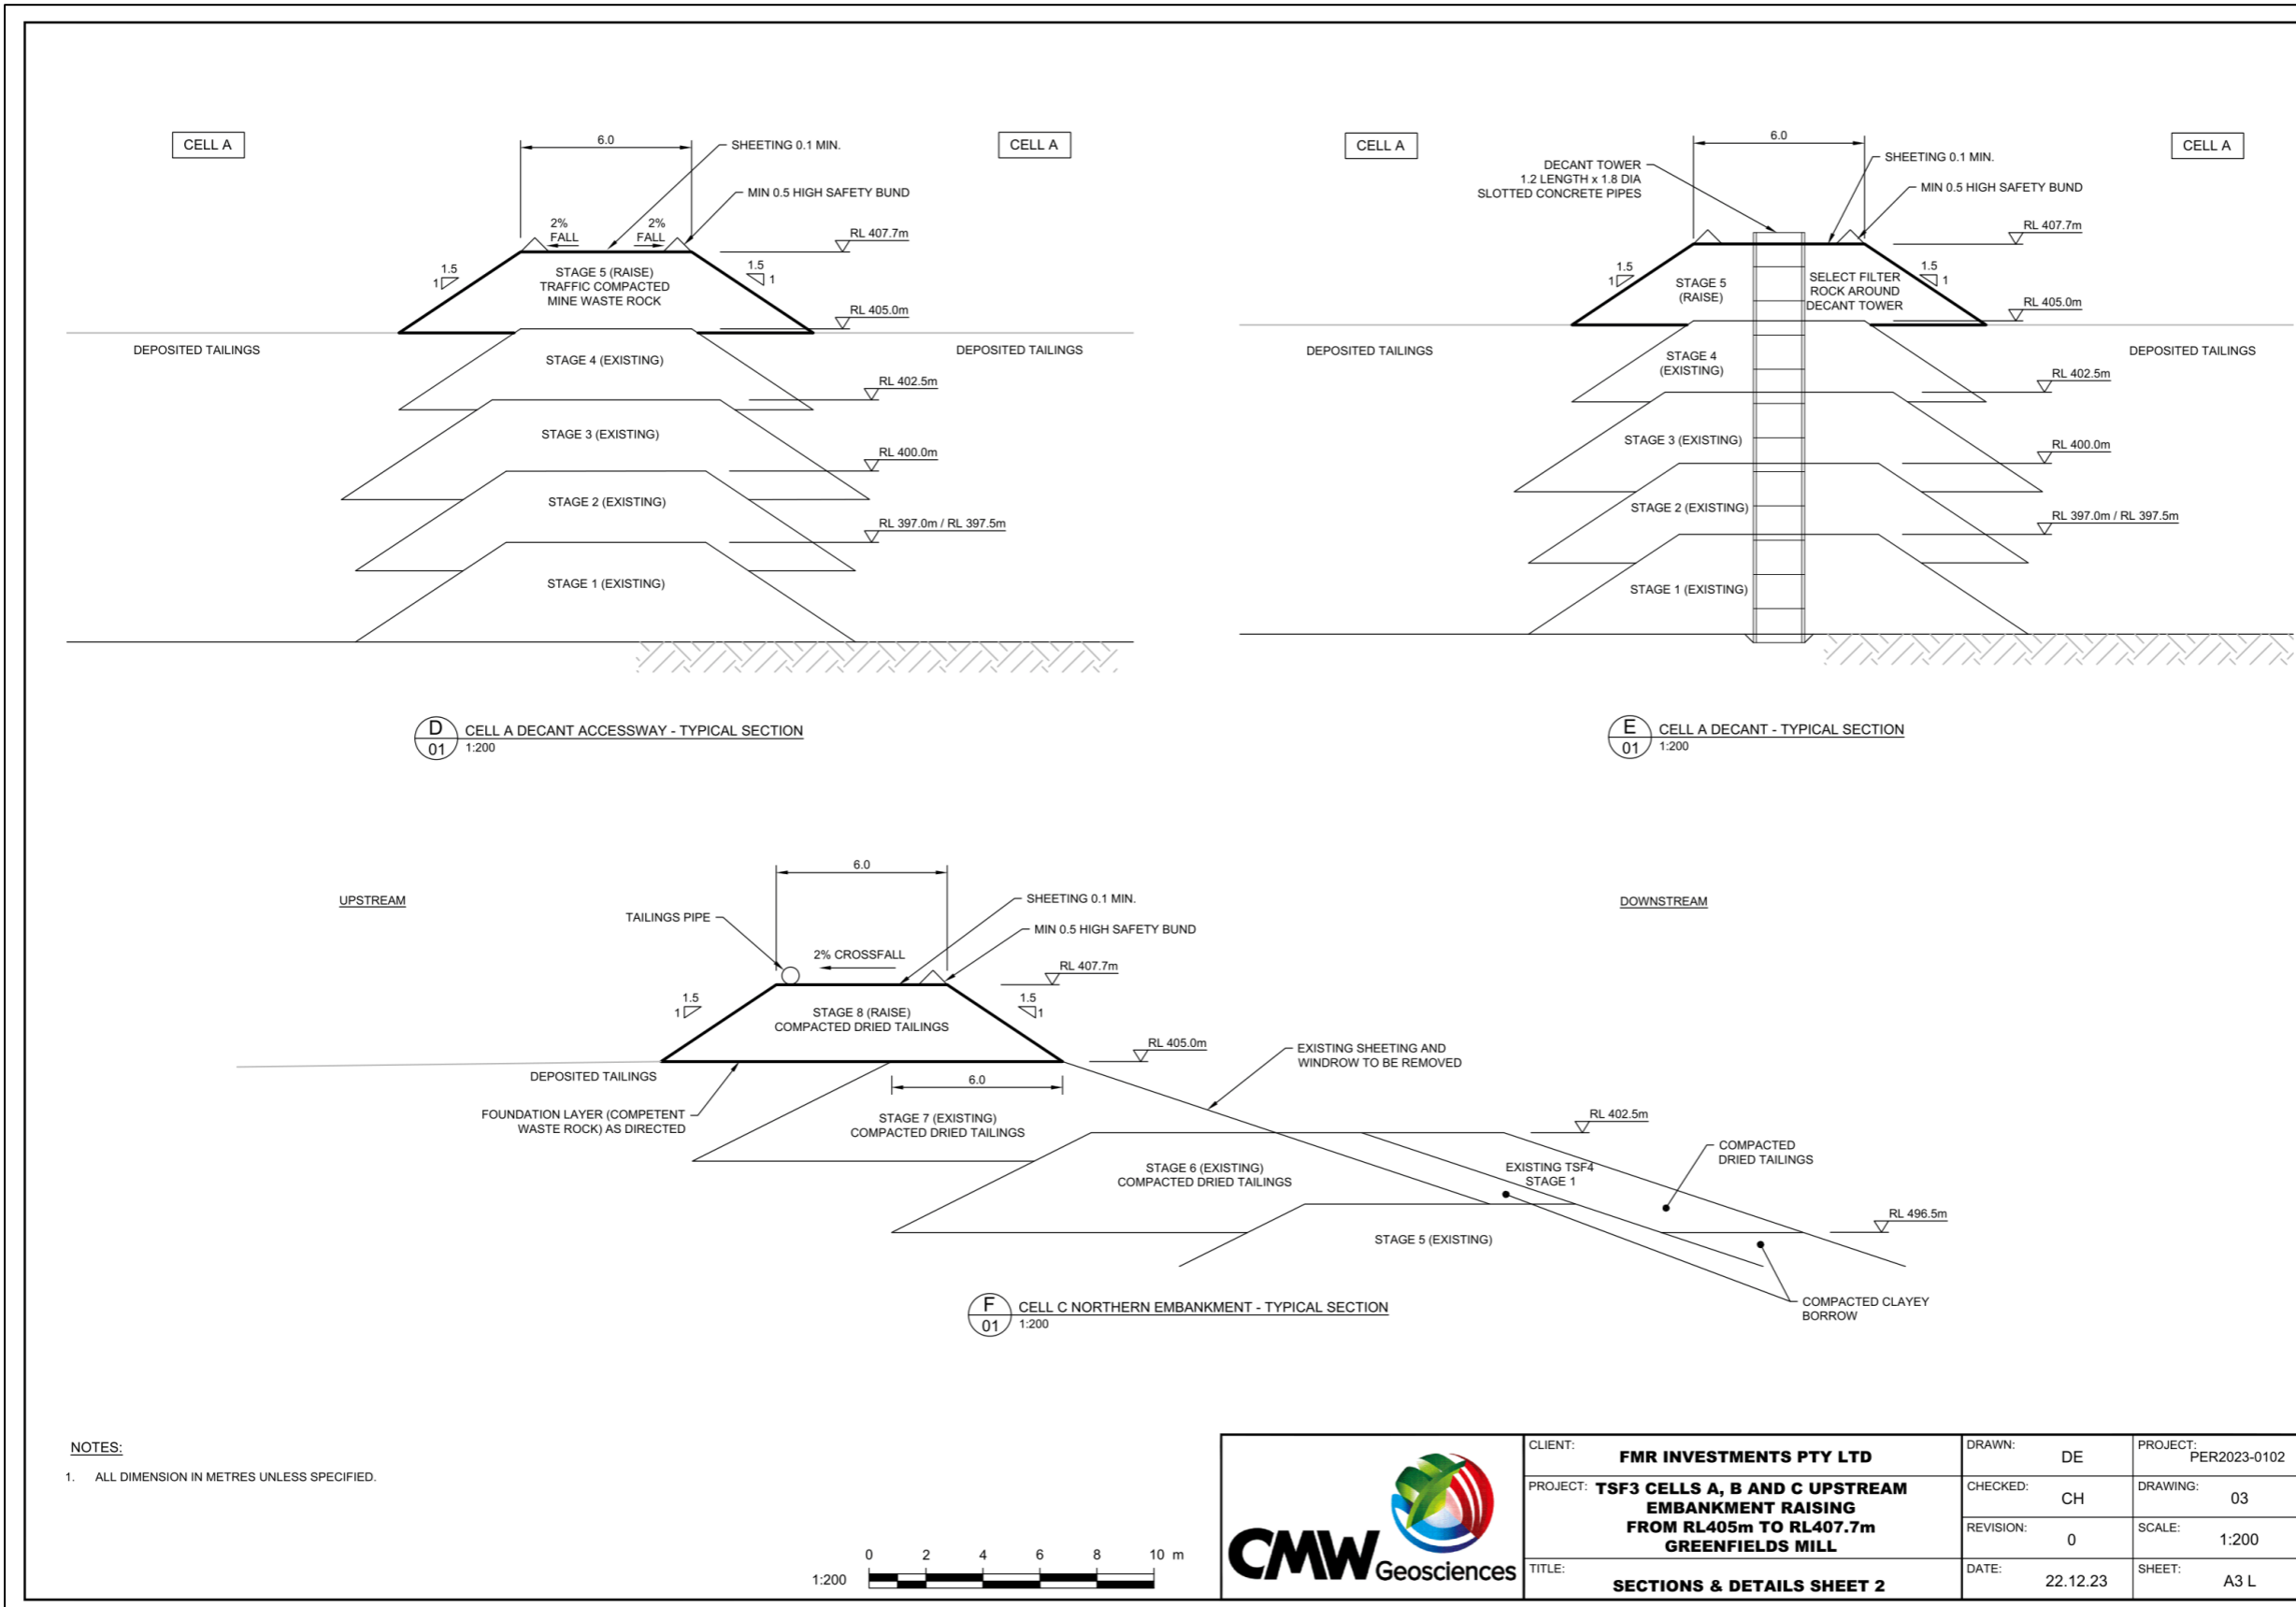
Design drawing (cross-section) for TSF3 Cell A Stage 5 embankment raise – decant structure and accessway and Cell C Stage 8 northern embankment raise
